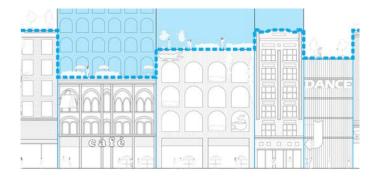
Elevation | illustrating façade expression along the street and the approach to differentiating between Heritage and Contemporary buildings.
